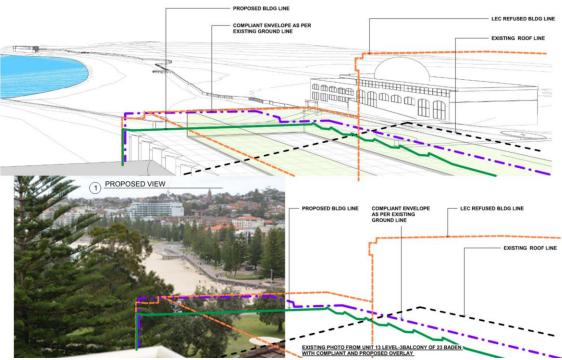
View analysis - 13/23 Baden St balcony - wider view (Source: Legge & Legge Architects)
